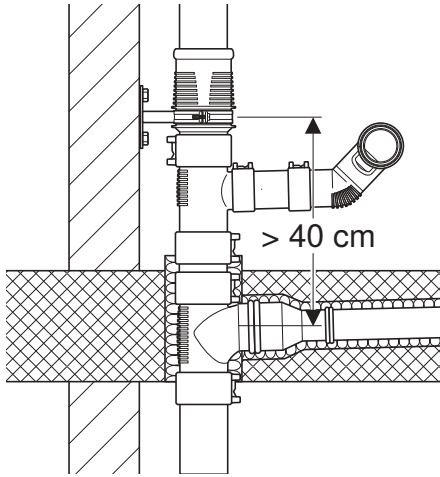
Equal branch fitting 88.5°, swept-entry, embedded in concrete, with reduced branch discharge pipe and a WC branch discharge pipe over the concrete
